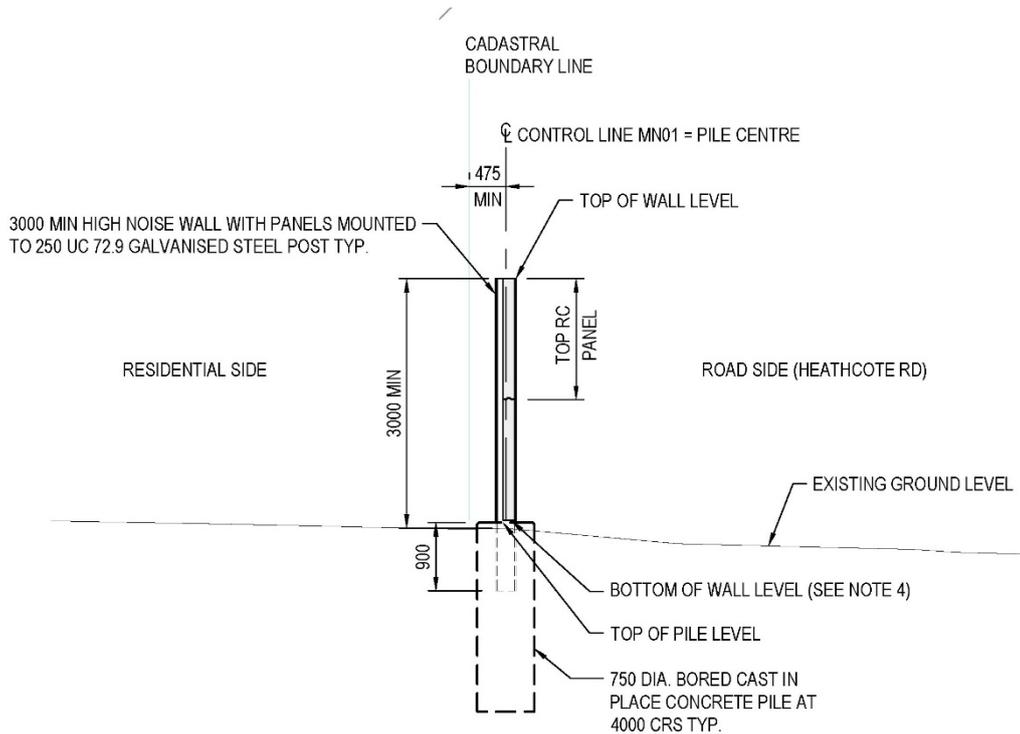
Proposed noise wall changes – NCA A – typical cross section
